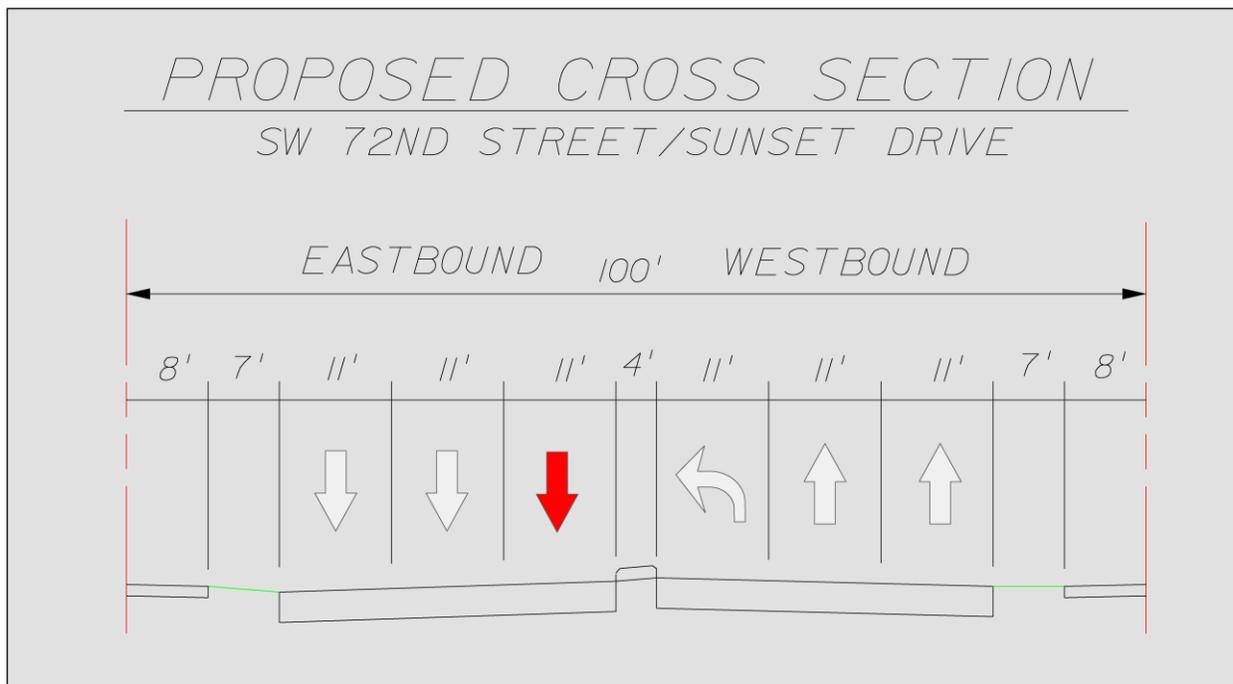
2: Proposed Roadway Typical Section along Sunset Drive
